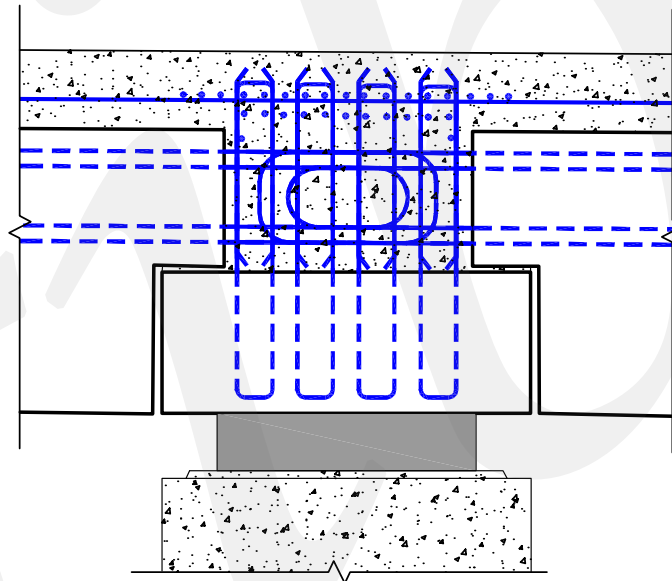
Continuity detail over a pier showing the mortar bed, neoprene bearing, precast concrete pier cap beam, dapped girder ends, and reinforcement.
